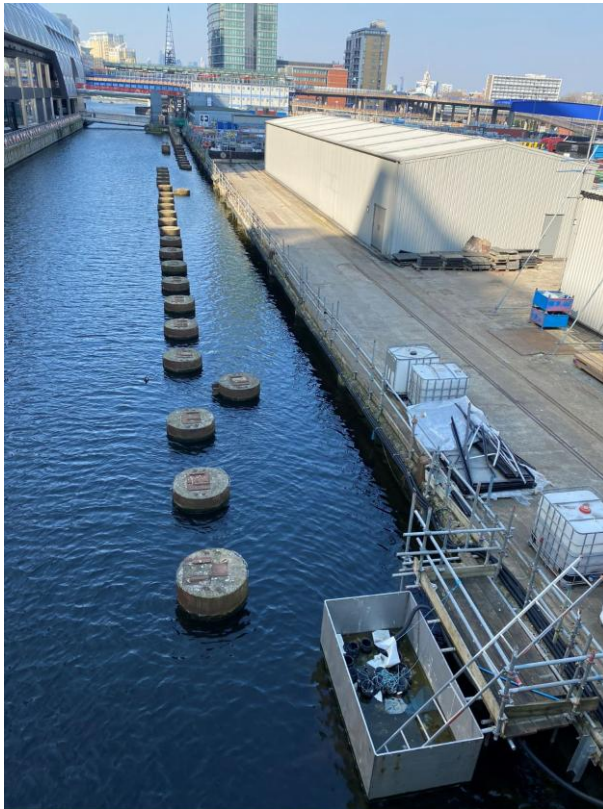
General view of the Site, looking west from Upper Bank Street road bridge. The new area that will be shaded extends slightly to the left of the existing concrete piles
